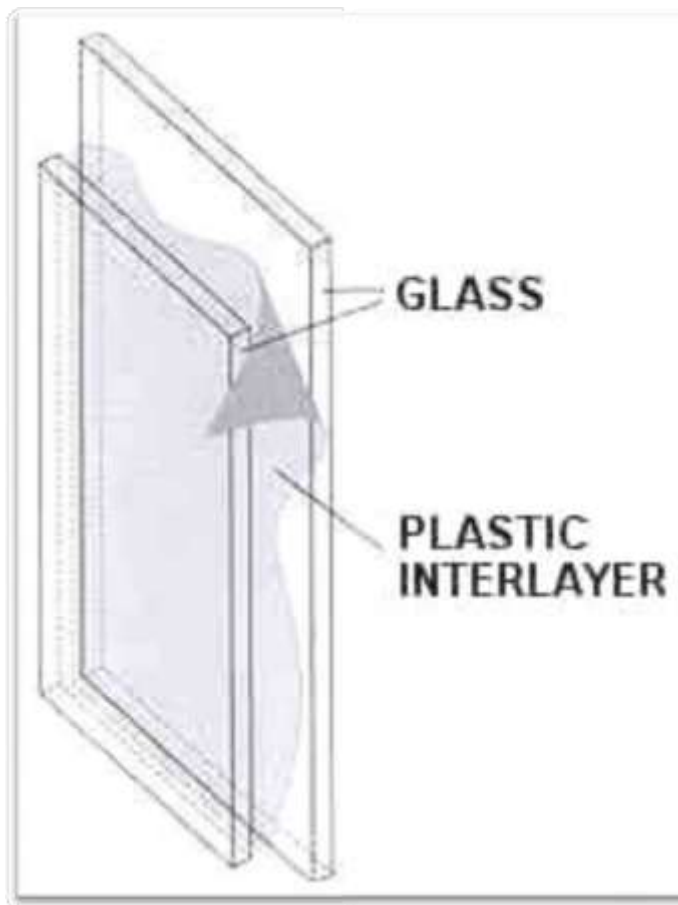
Laminated glass(Source: Building and Construction Authority, 2005)
